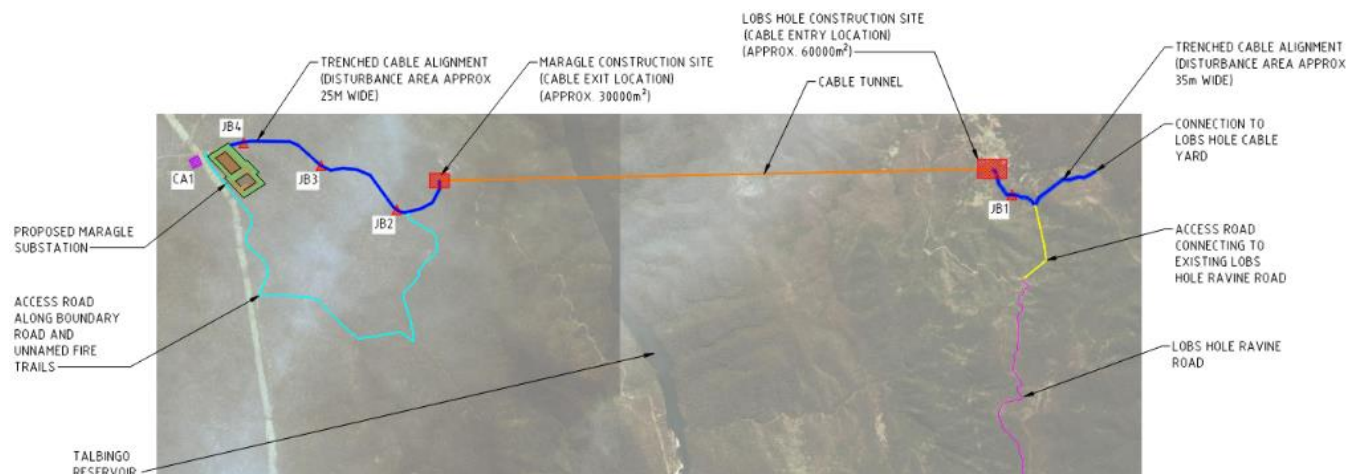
Option 8 hybrid trench/tunnel alignment
